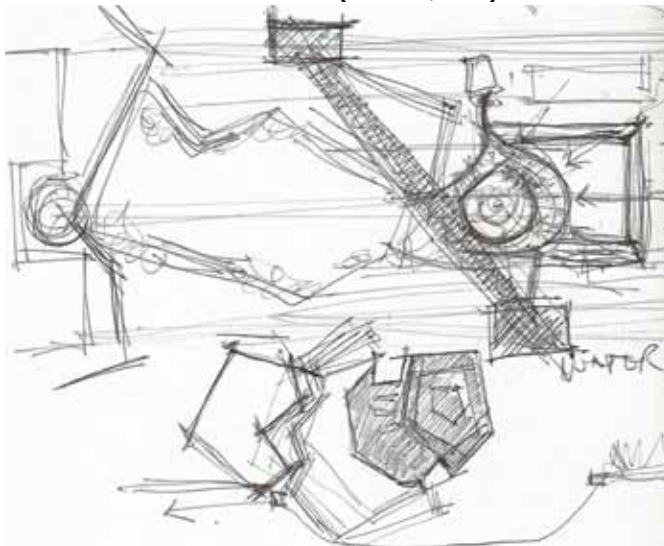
SITE PLAN REVISION 4 (AUTHOR, 2011)
